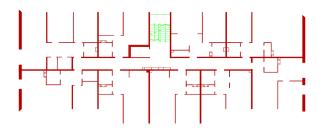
Load bearing walls system (Hakkapeliitta Village)
